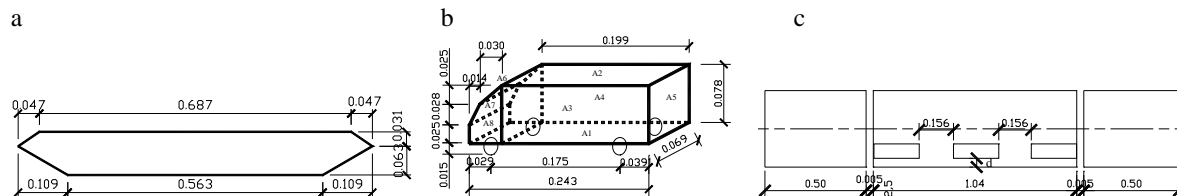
Model geometry and overall dimensions (Unit: m) (a: Bridge cross section model; b: Vehicle model; c: Layout plan of the model)
